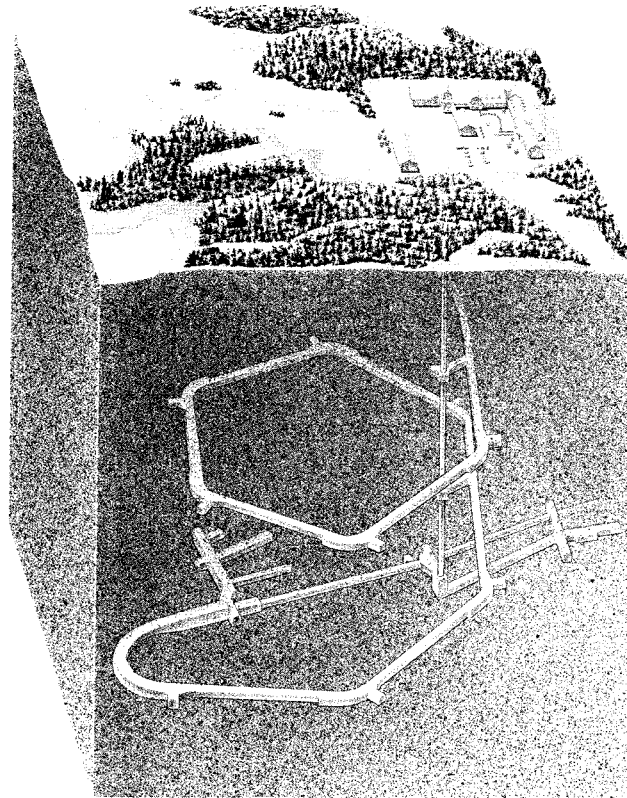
The underground portion of the Äspö HRL reaches a depth of 460 m. The underground facility is connected with offices, workshops and storerooms on the surface by a hoist shaft and two ventilation shafts.
